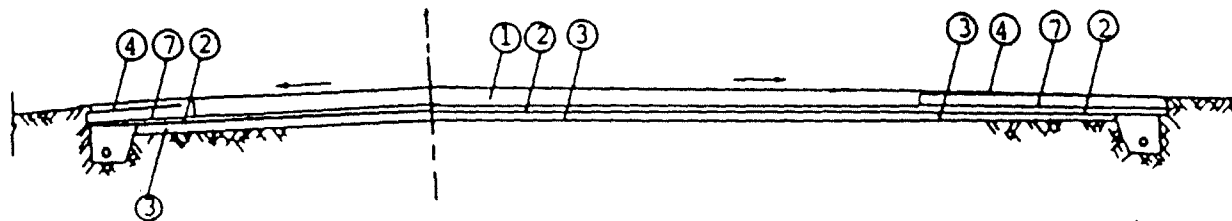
Internally drainable road cross-section with drains at the edge of pavement.[50]
